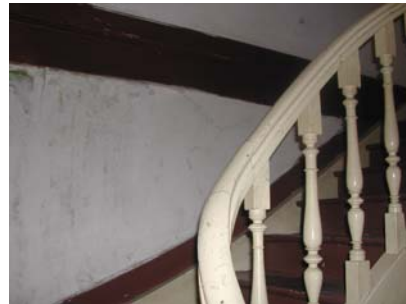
U-type wooden stairs, Halil Rifat Paşa Street No. 74
